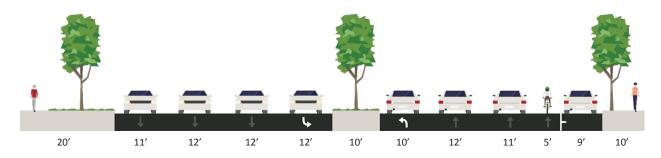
Ashley Drive Typical Cross-Section, between Madison Street and Twiggs Street
